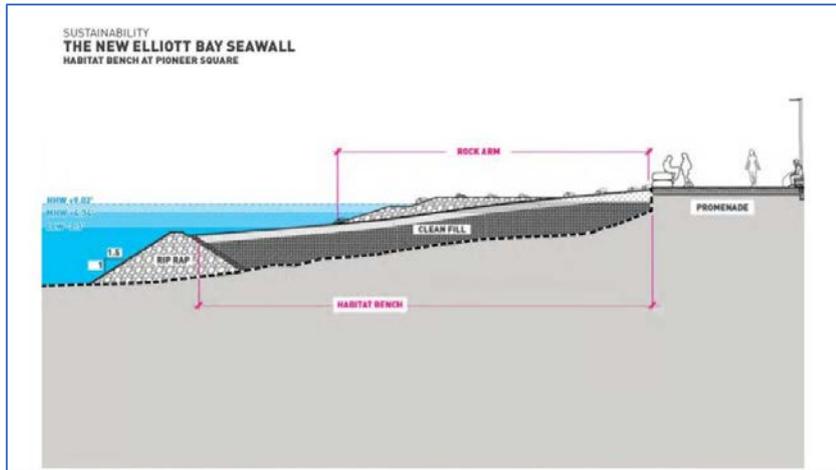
Elliott Bay Seawall Design Cross Section [19]
